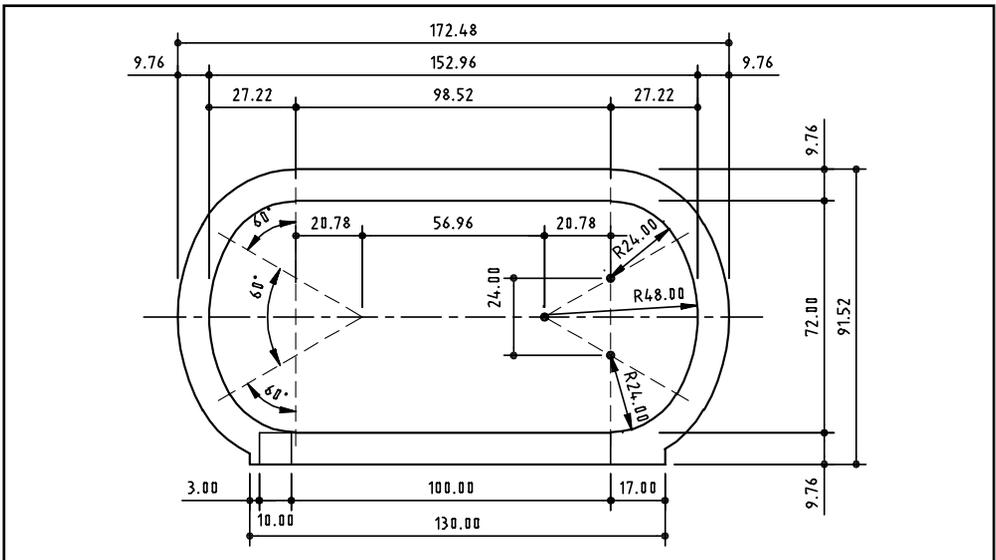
Shape and dimensions of 400m Double Bend Track (Radii 48m and 24m)
